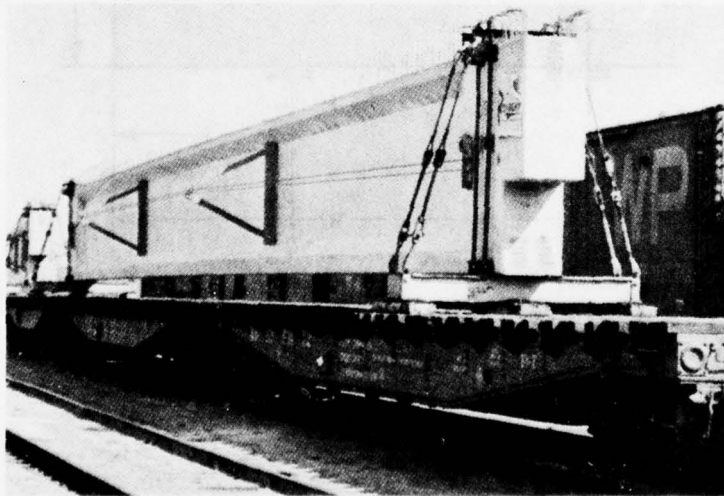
Long girder transported by rail cars (courtesy of American Concrete Institute<sup>59</sup>)
